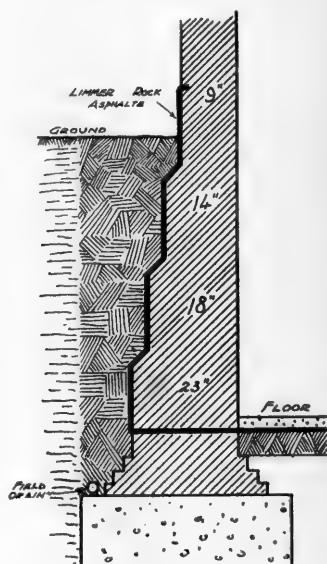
Type of retaining wall for a building with very high adjoining ground. The damp-proof course is carried under all the floor and jointed carefully to the vertical asphalt.
